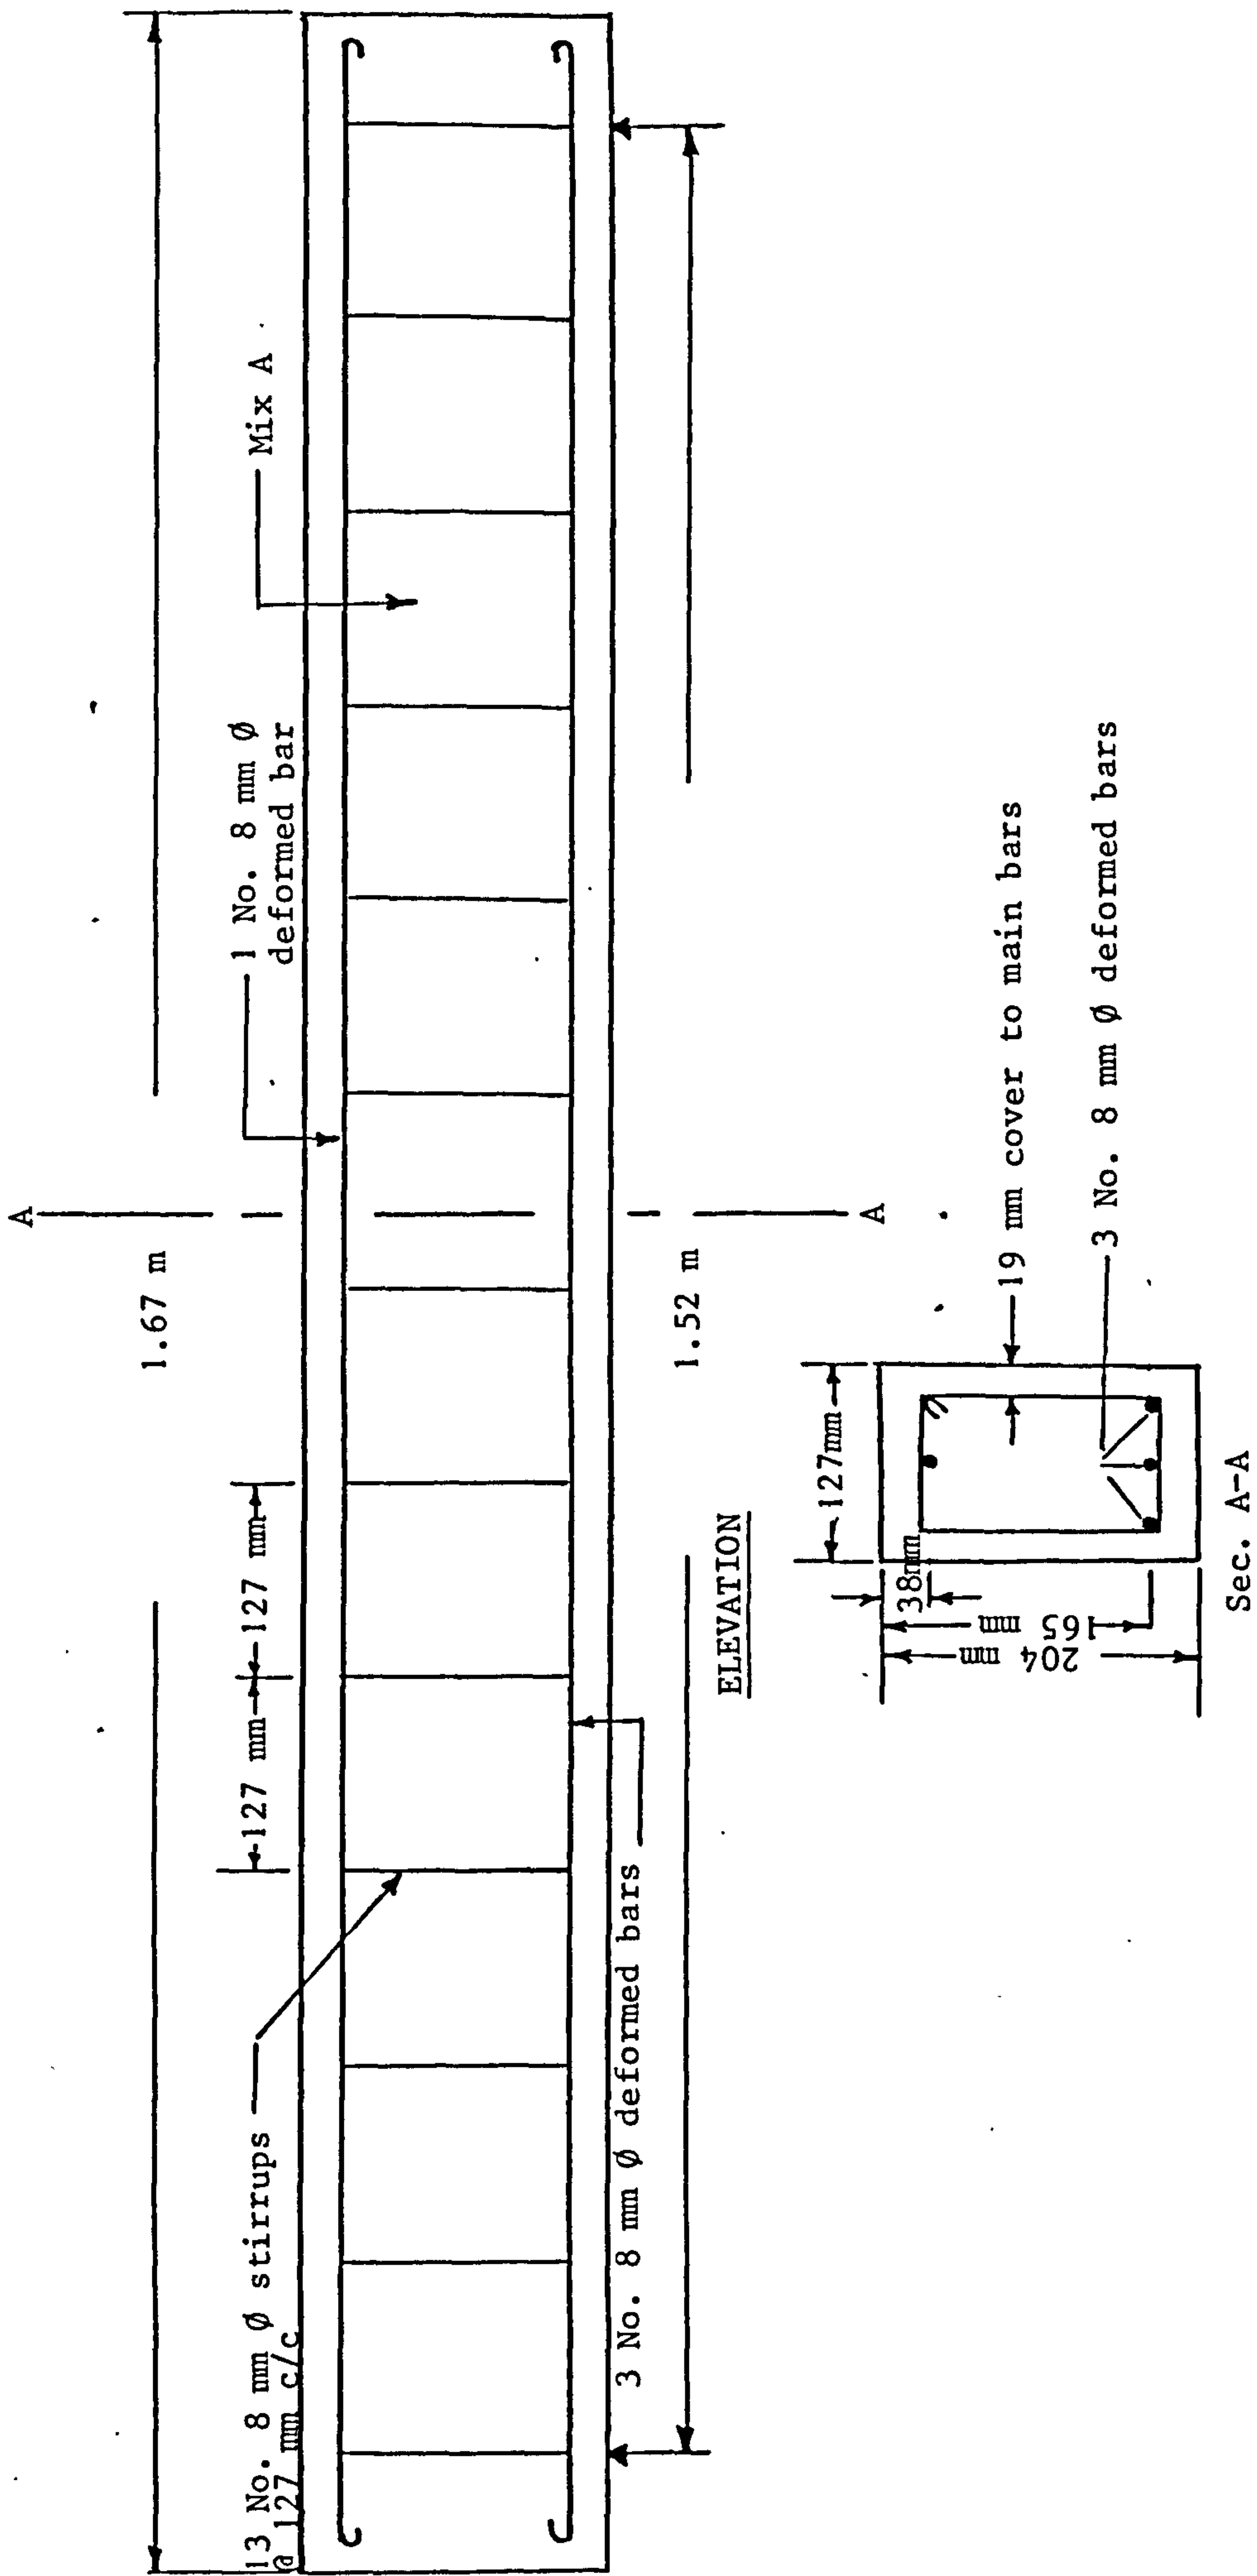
Diagram showing reinforcement in reinforced concrete simple beam
